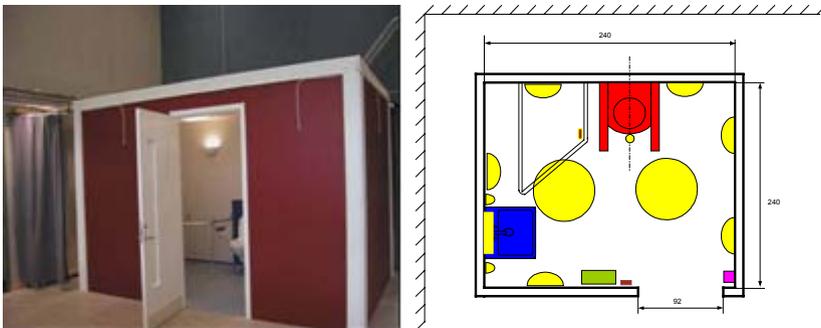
, 3. The FRR test room in Lund. Left side (Fig. 2) shows the entrance door, in the background the toilet bowl. Right side (Fig.3) shows site plan with bowl, sink and light sources.
